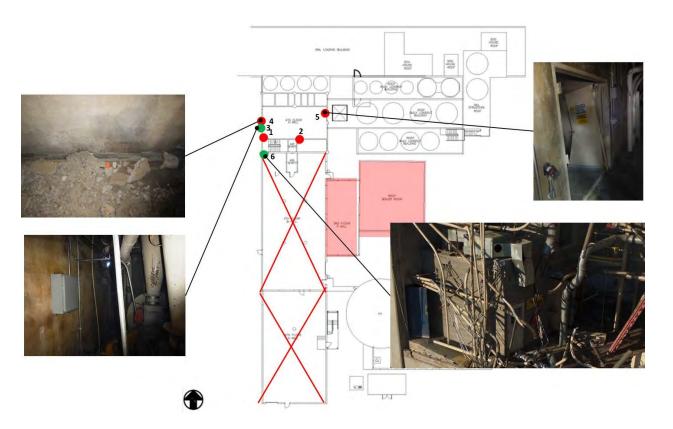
Mill A and Mill B Level 4 Exemplar Blast Indicators
